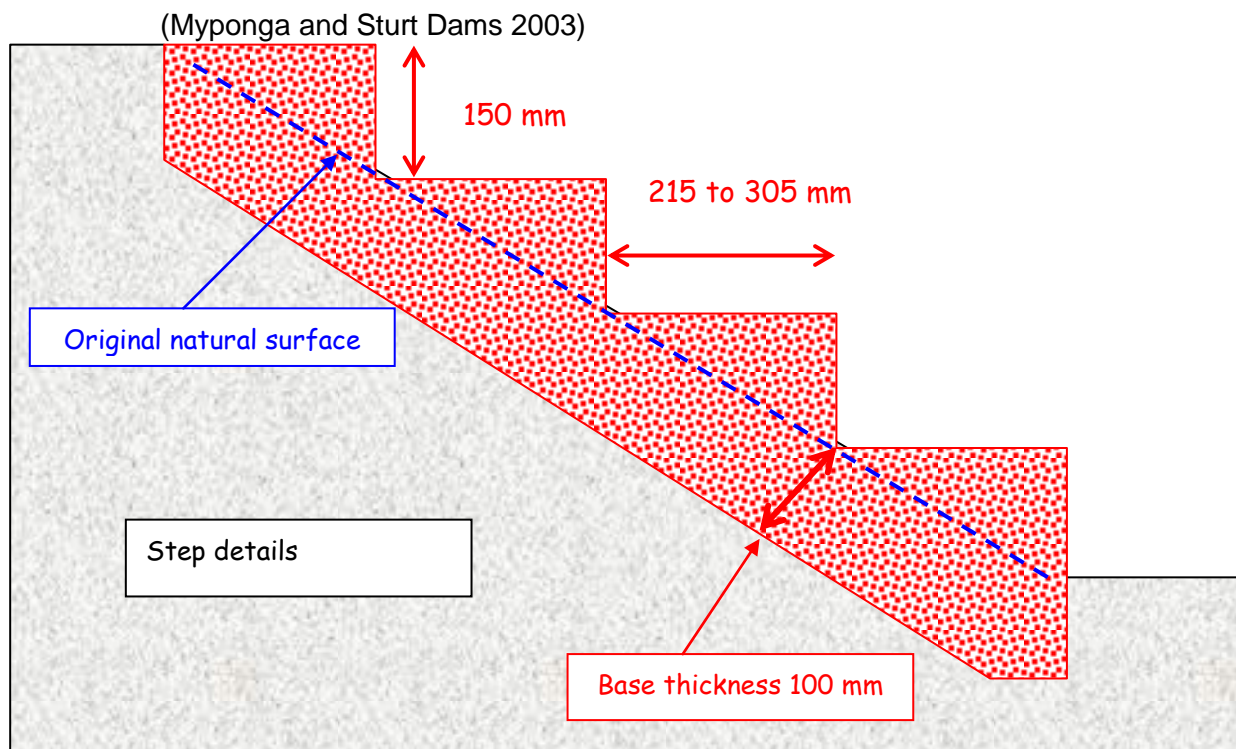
Standard Design for Shallow Rock Foundation.
